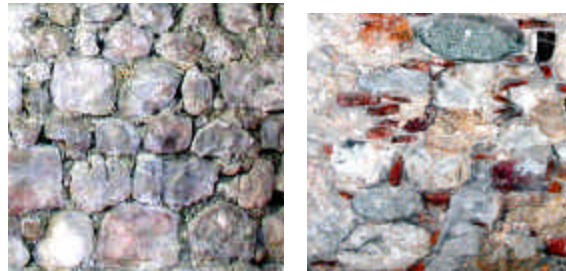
Avio Castle. Masonry typologies of the external walls and of partition walls
